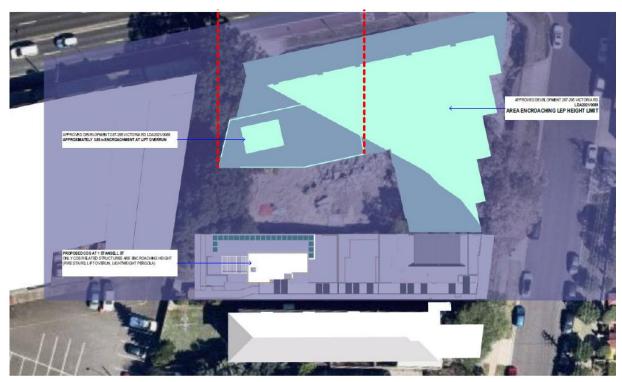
Building height diagram (the building in green shading is the adjoining approved development at 287-295 Victoria Road)
